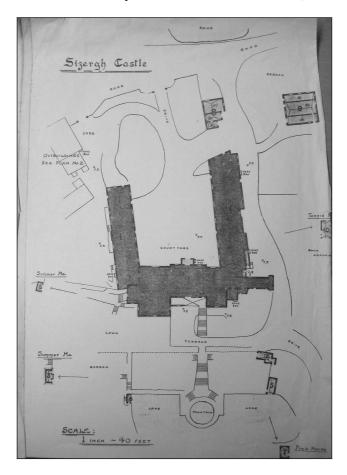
General plan of Sizergh Castle and Gardens (?1940-1950)
